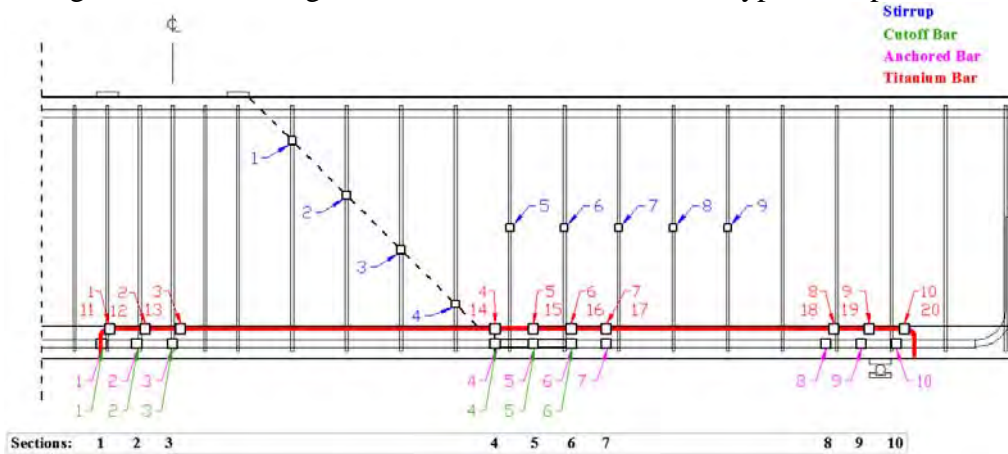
Labeling convention of cross sections in typical IT-specimen.
